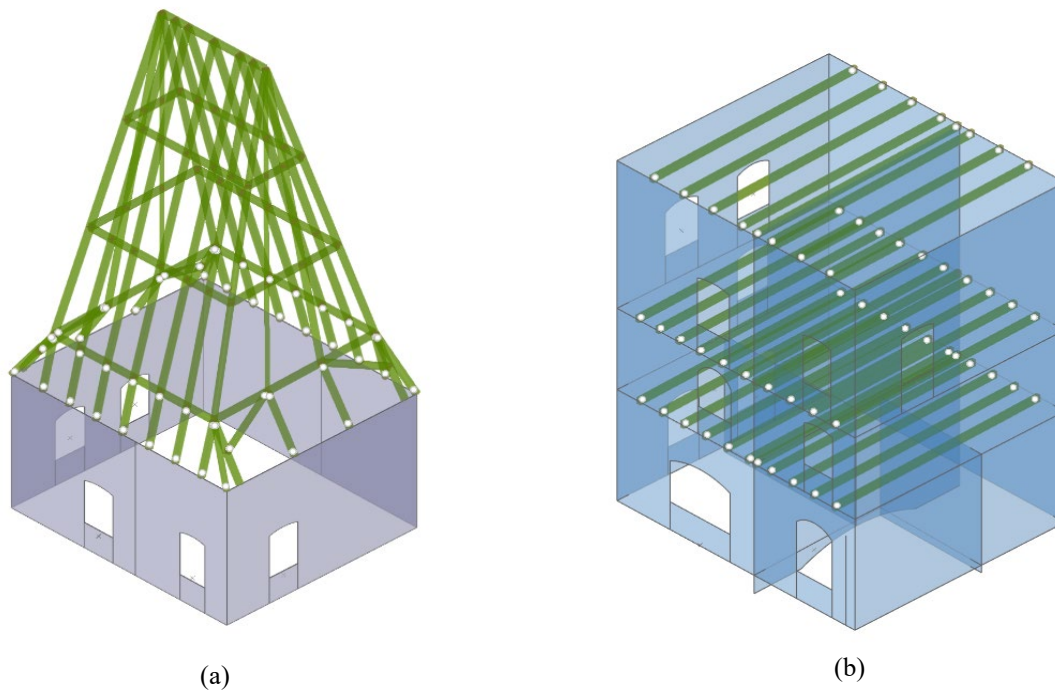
Beams elements (a) The roof, (b) Second and third floors.
